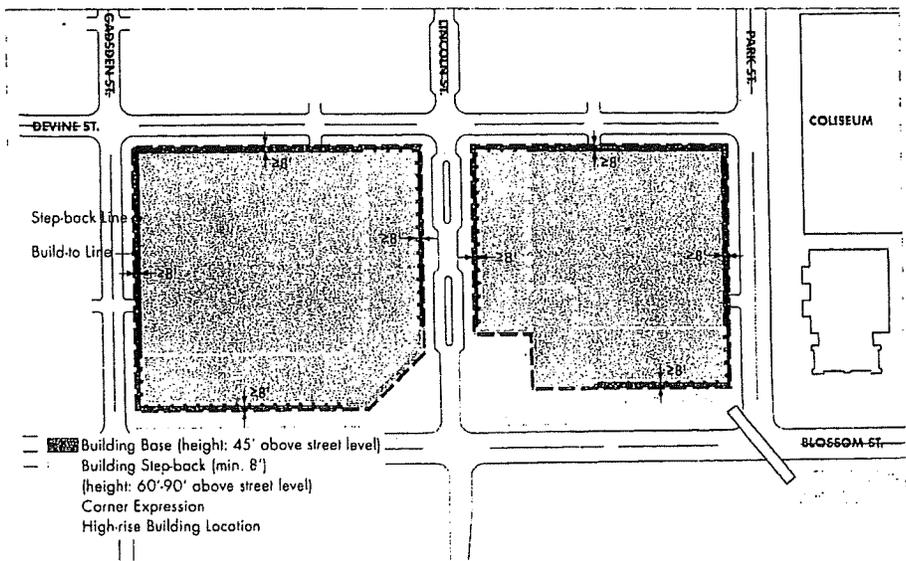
LINCOLN STREET GATEWAY BUILDING ENVELOPE
